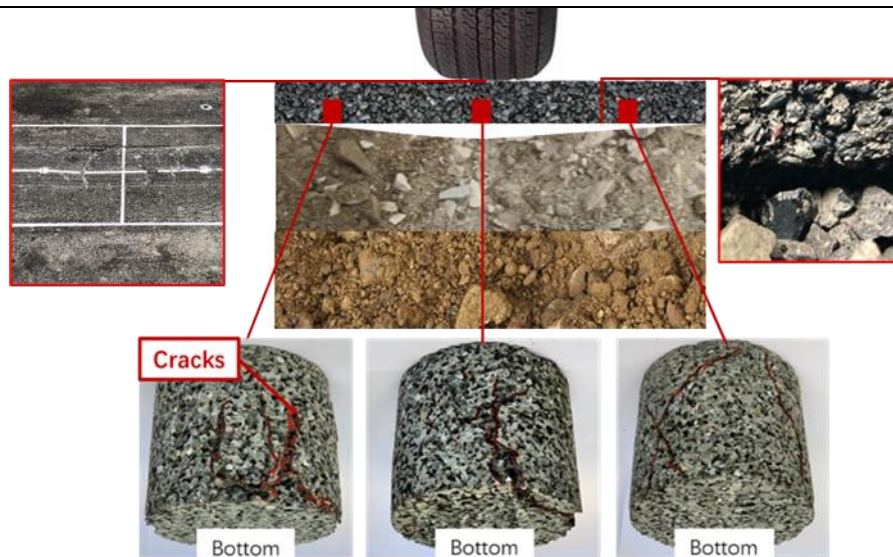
Schematic graph of pavement structure at failure and cracks propagation in the cores from the PUPM surface
